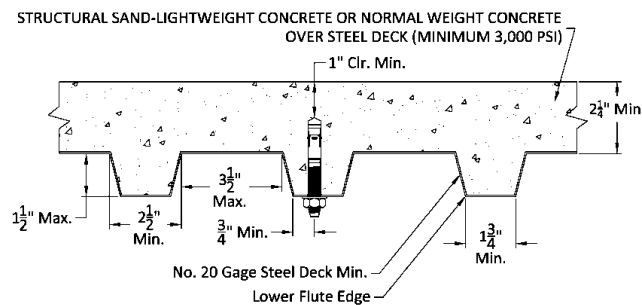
B —POWER-STUD+ SD2 INSTALLATION DETAIL FOR ANCHORS IN THE SOFFIT OF CONCRETE OVER STEEL DECK FLOOR AND ROOF ASSEMBLIES (SEE DIMENSIONAL PROFILE REQUIREMENTS)<sup>2,3</sup>
